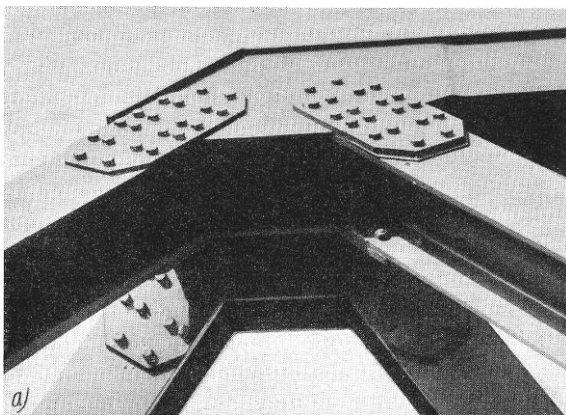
Prestressed-bonded steel-truss nodes [9]
